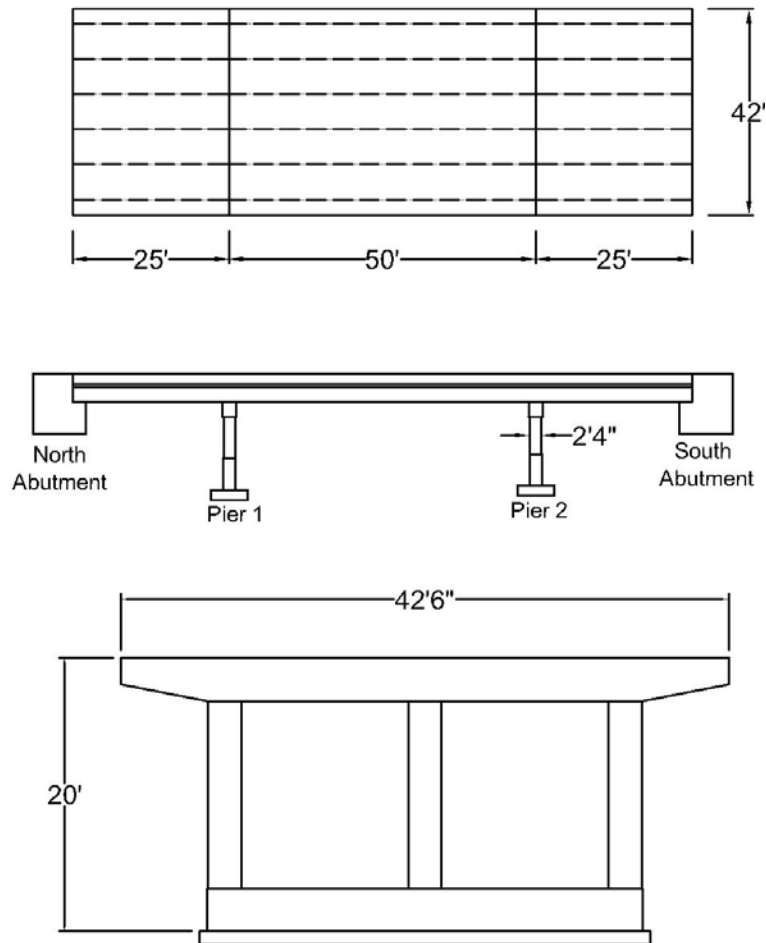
Plan, Side View, and Pier Elevation for 3-Span Benchmark Bridge No. 1.
